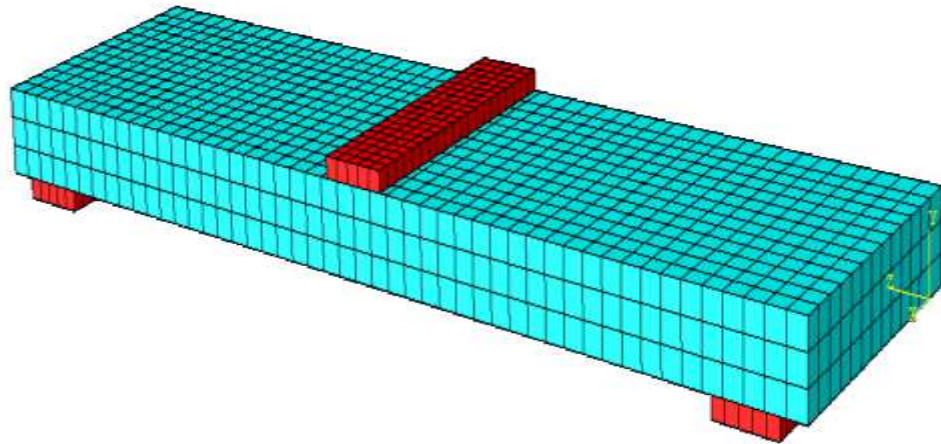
Assembly and mesh for W specimen by ABAQUS
